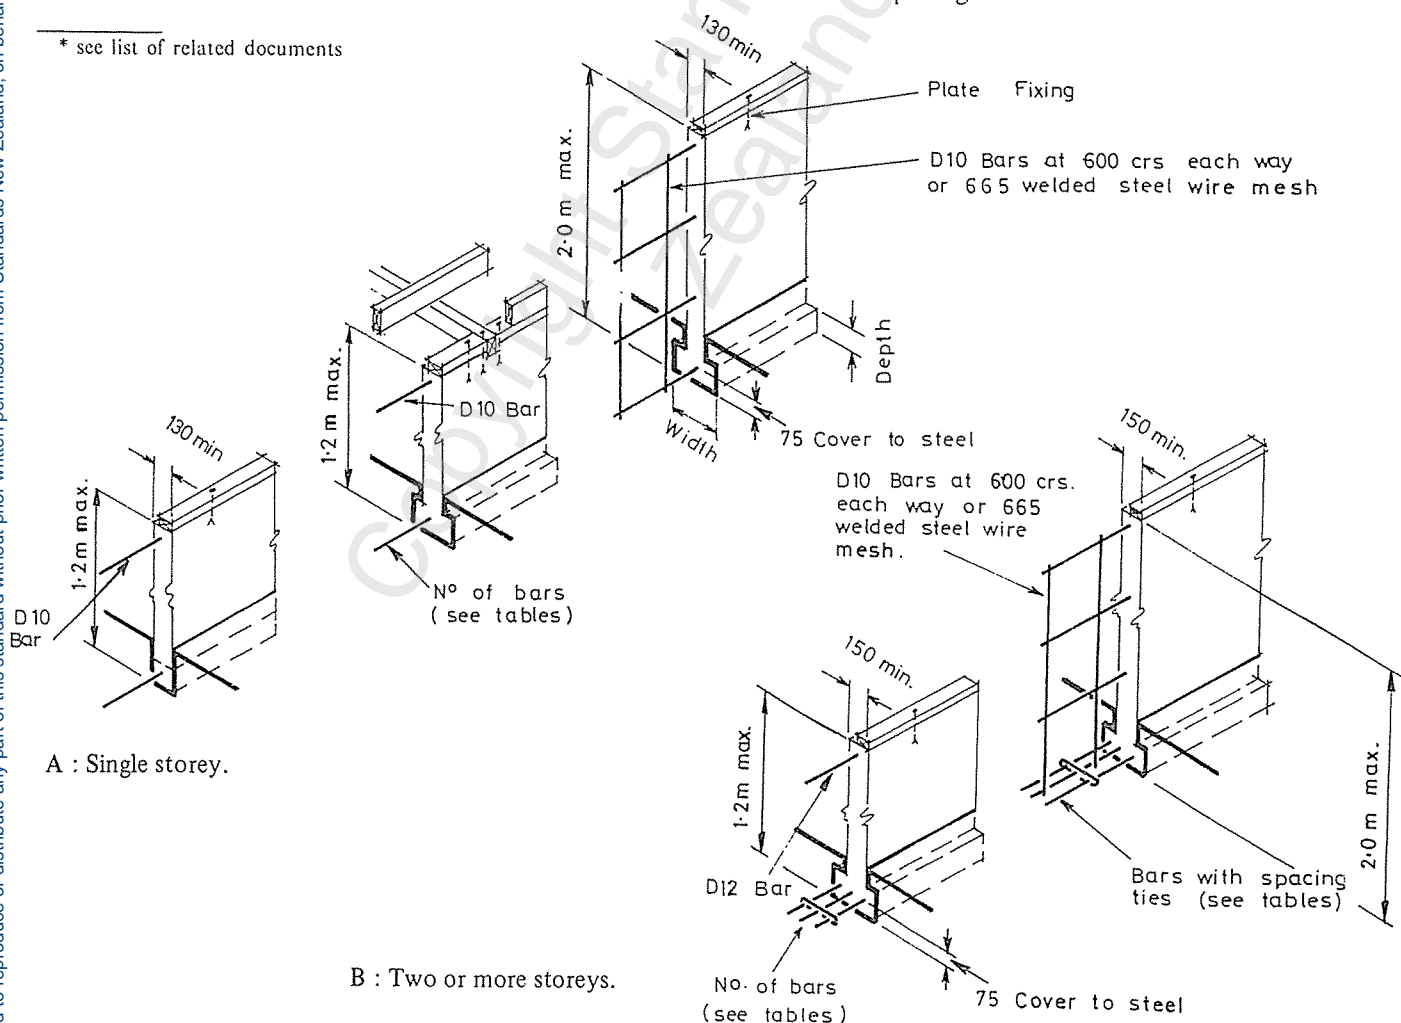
Reinforced concrete foundation walls (not cantilevered)
